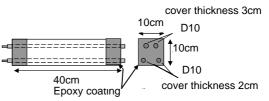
Reinforced concrete specimen for testing on corrosion of rebar
